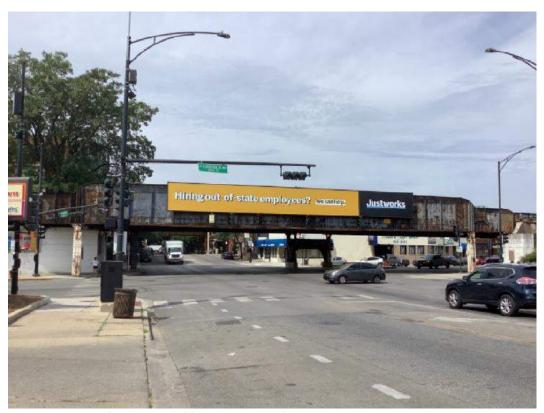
Lincoln Avenue/Addison Street Bridge
